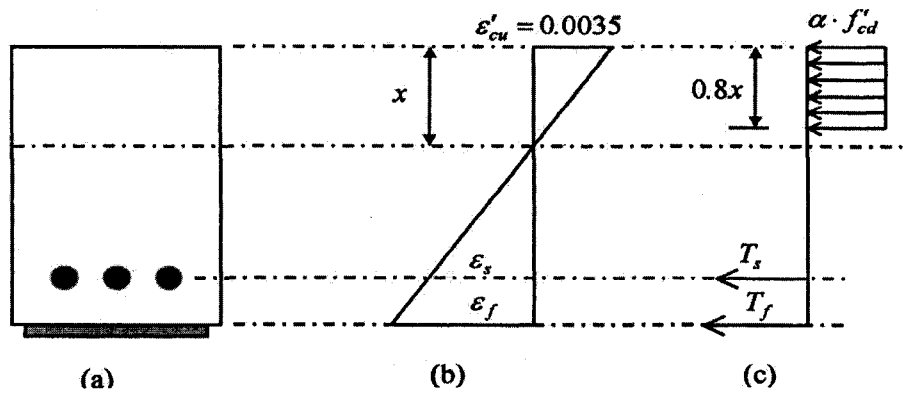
Flexural Analysis of Reinforced Concrete Sections with CFRP
